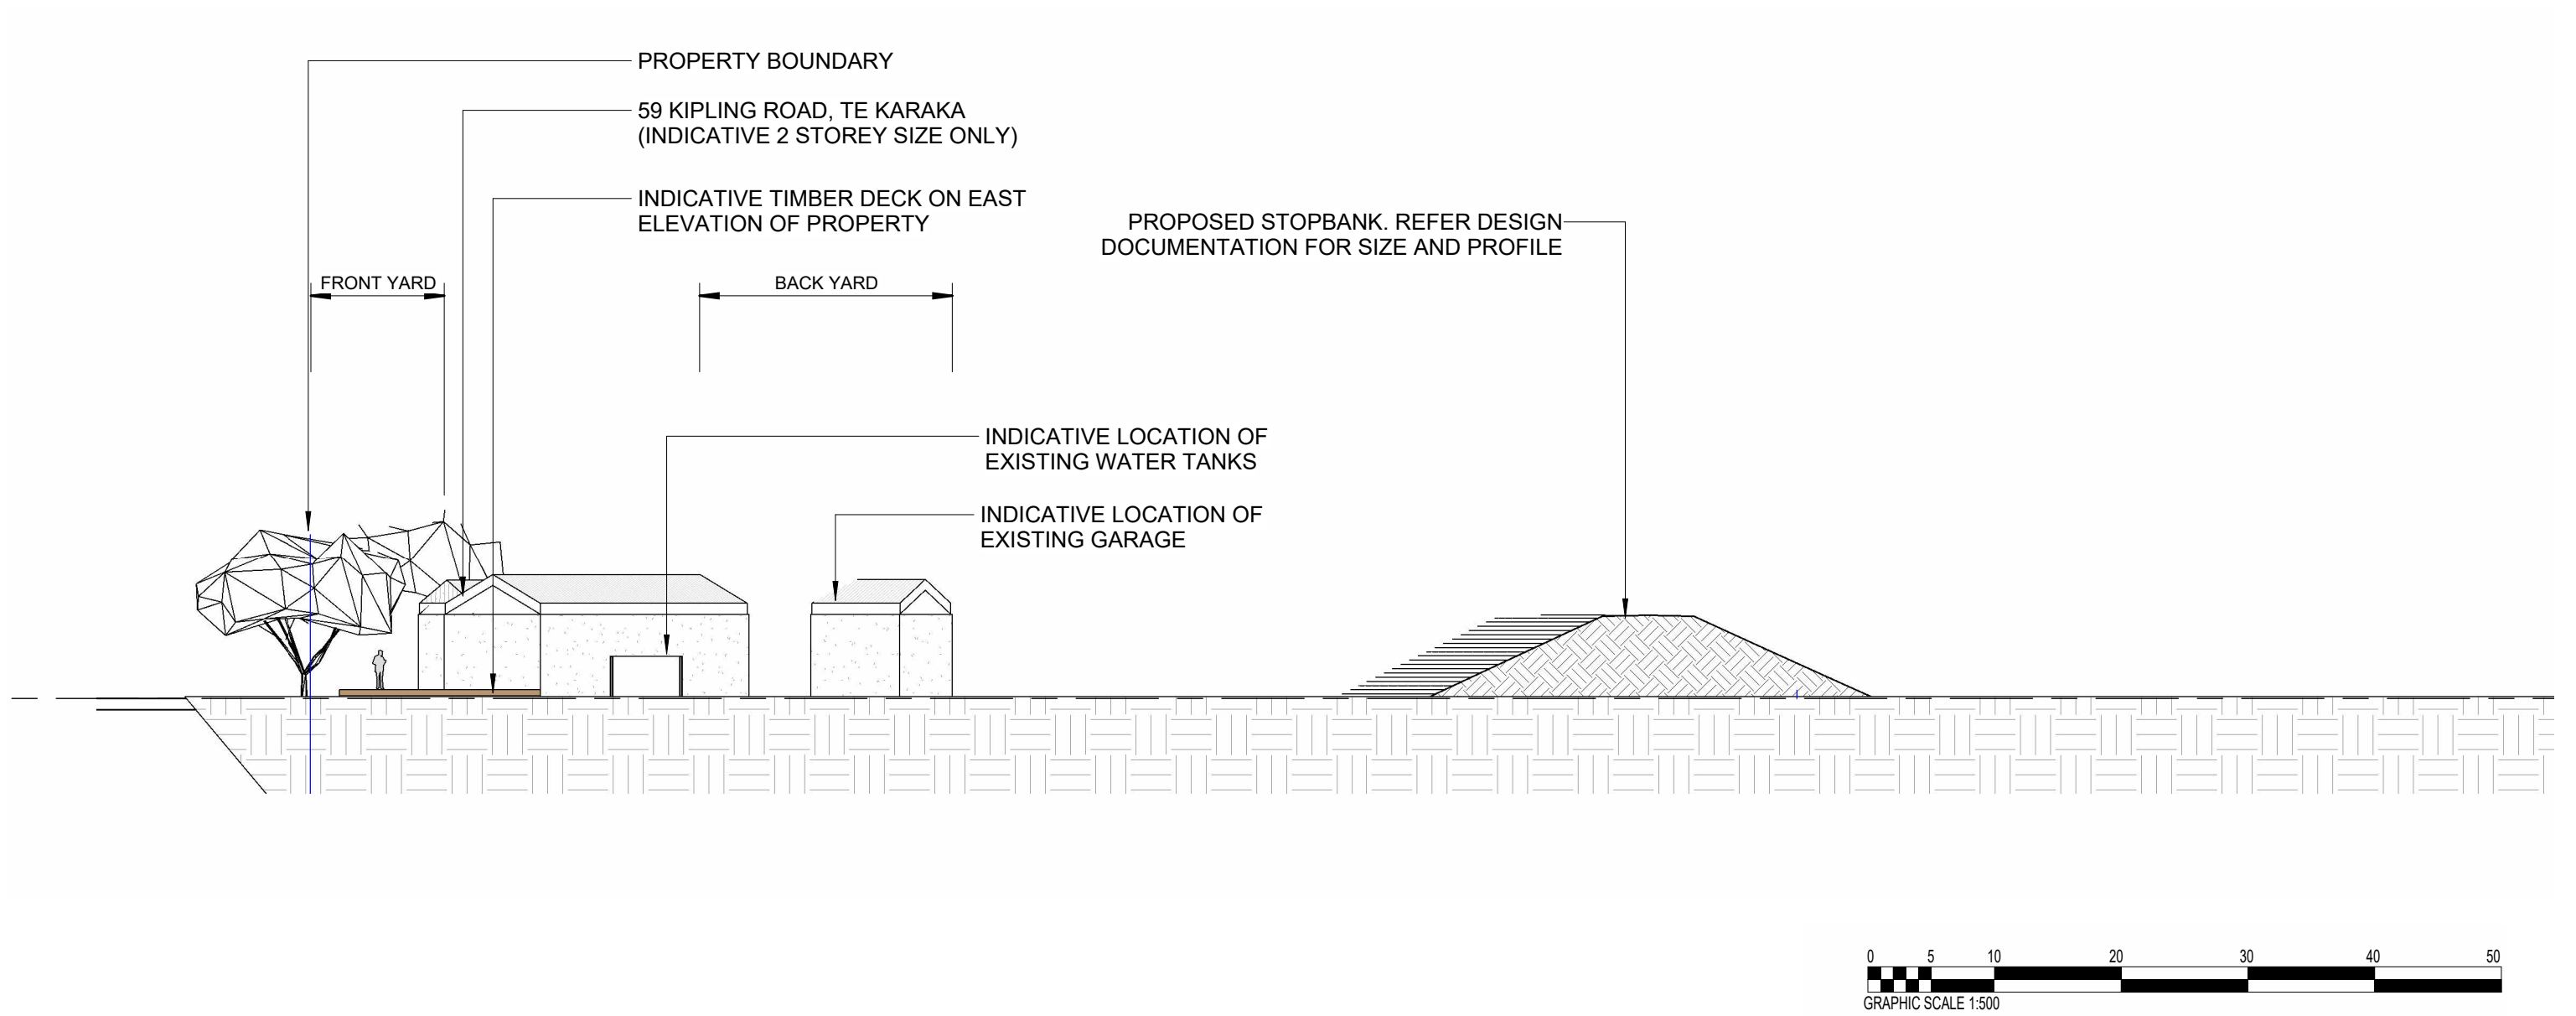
Section B from building to the edge of the stopbank. Decking extent, house height and roof shape is indicative only to provide guidance on the scale of the stopbank.
